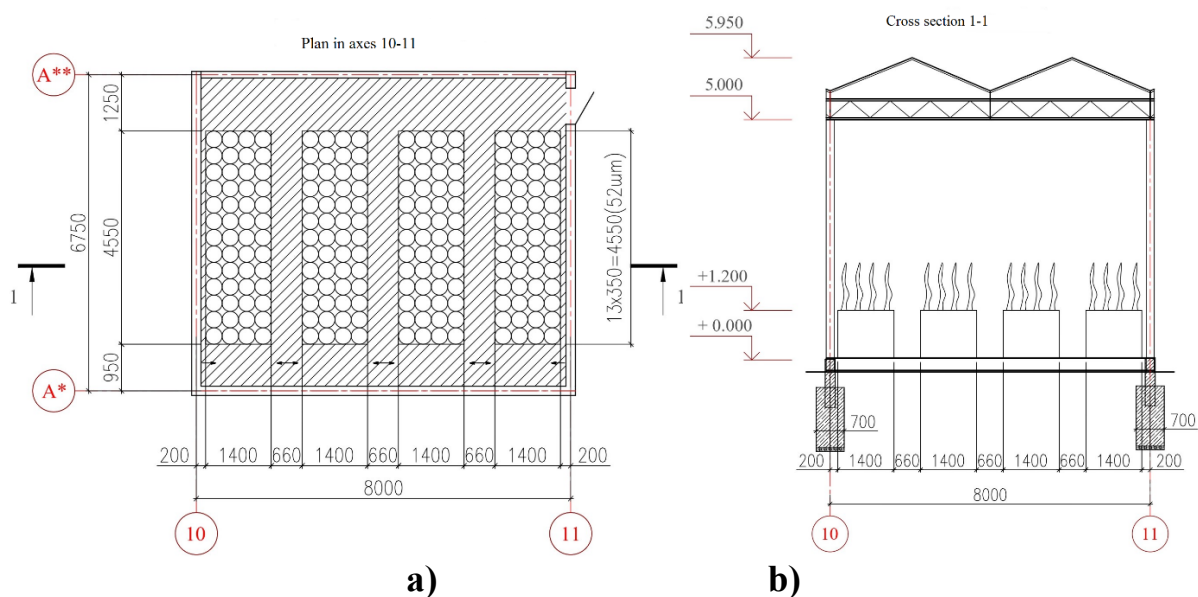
Technological features of plant placement in the plan (a) section (b) of the mini-box of the greenhouse of the department of creating infectious backgrounds.
